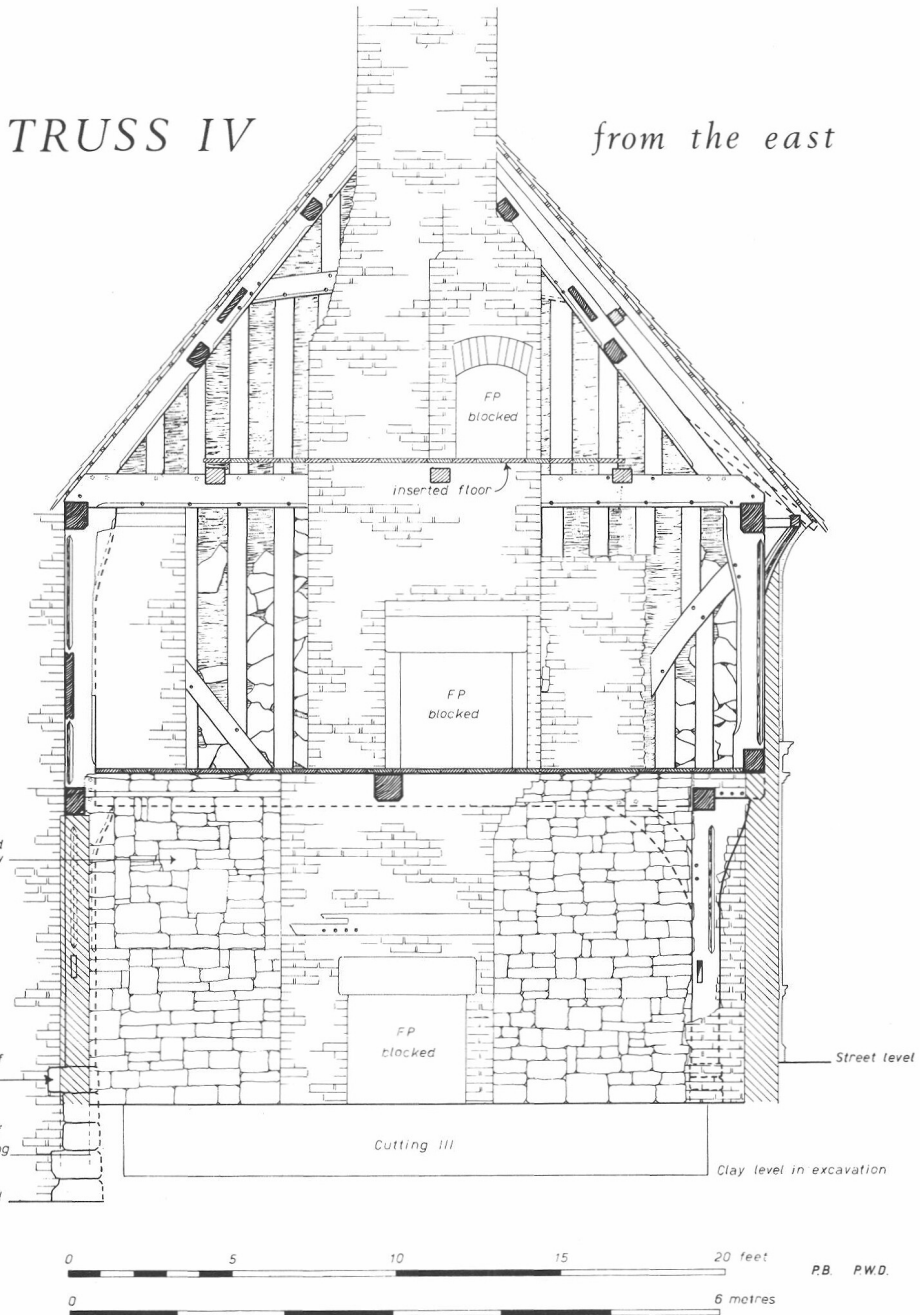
The Peacock Inn: the timber-framed building—Truss IV
